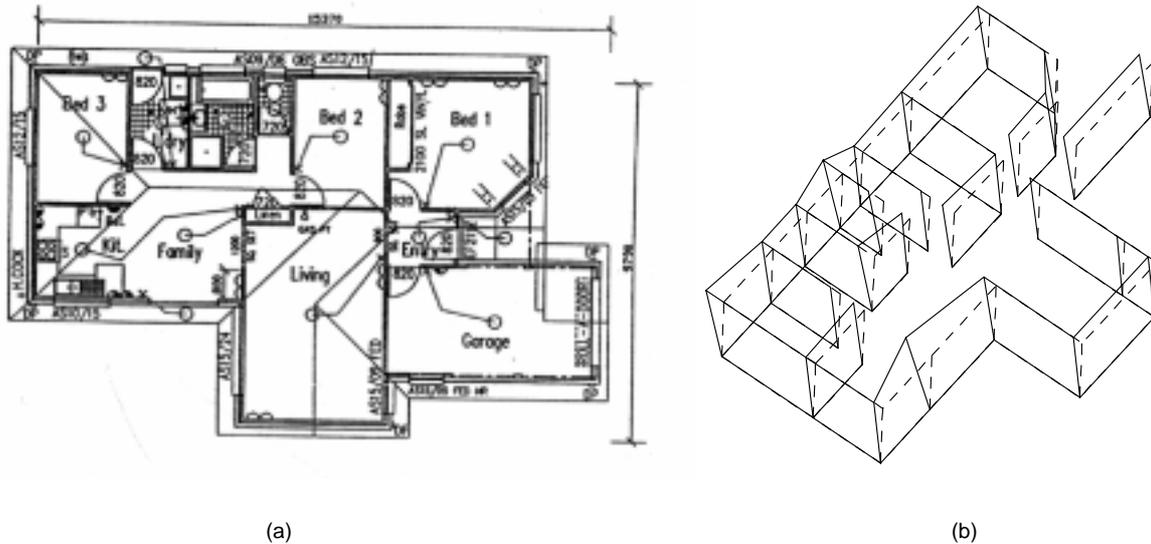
The Currawong floor plan and snap shot of the animated sway mode shape
